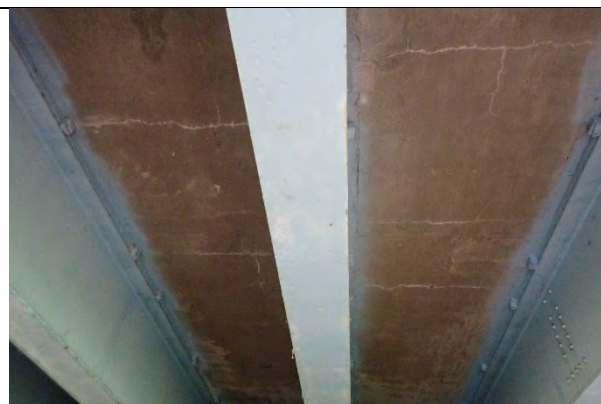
General example of transverse and map cracks with efflorescence on the soffit. Span 1 between Girders 4 and 5 shown.
